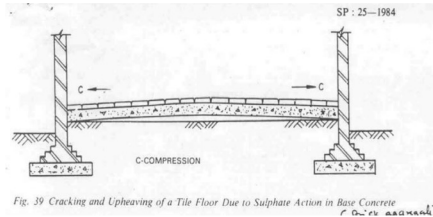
Cracking and Upheaving of a Tile Floor Due to Sulphate Action in Base Concrete
